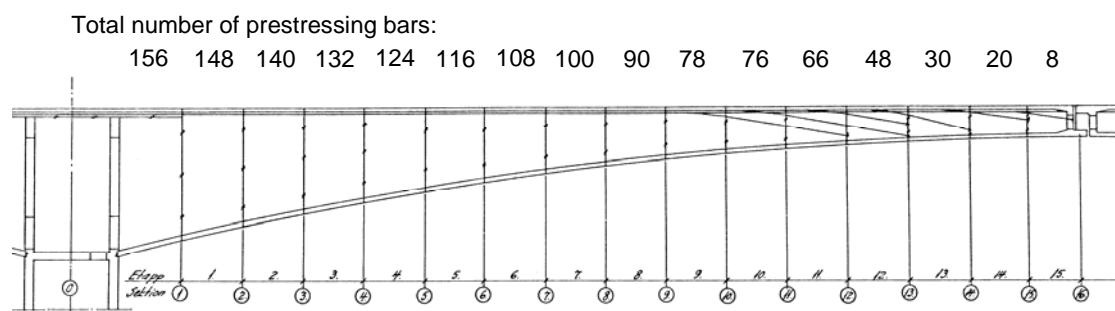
Longitudinal prestressing tendons in the Cantilever II. From drawing O497ap.
